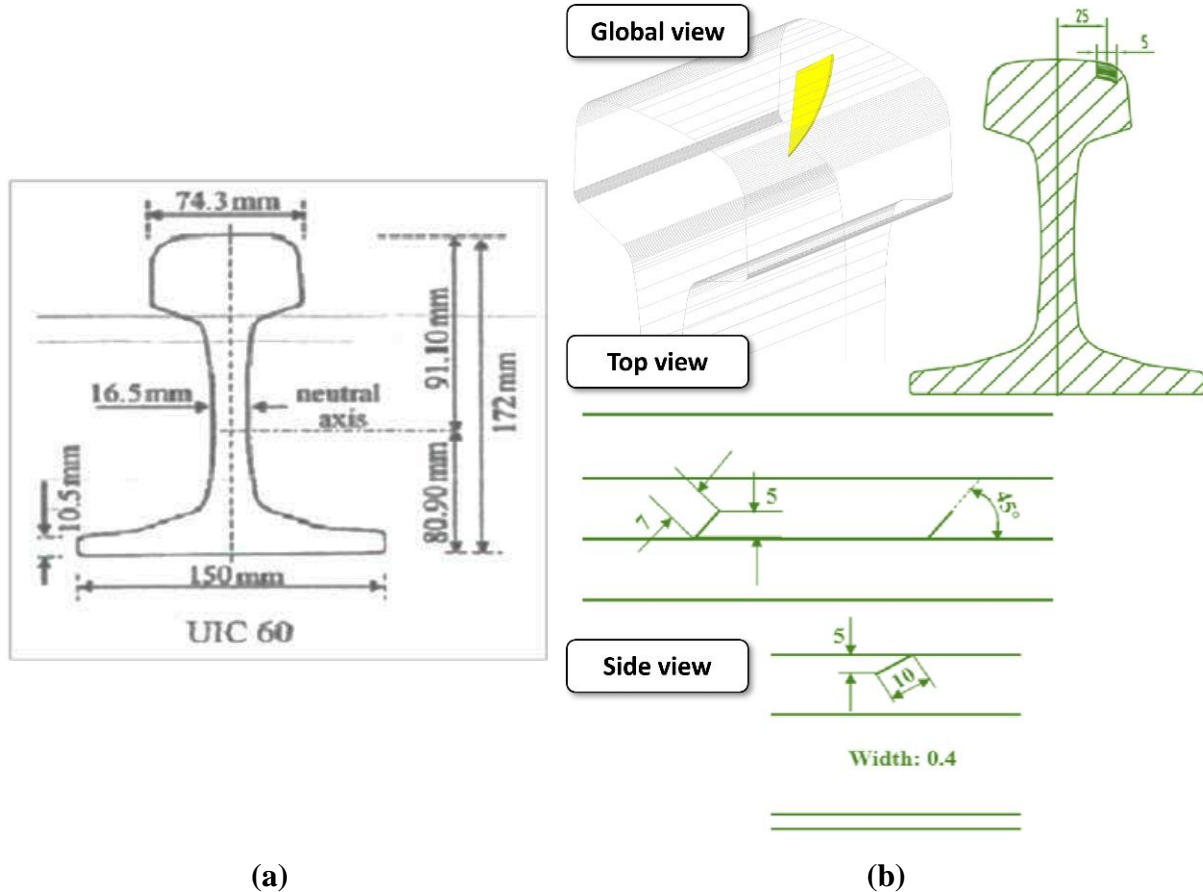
(a) UIC60 rail dimensions; (b) Schematic diagram of crack dimension (5 mm depth).
